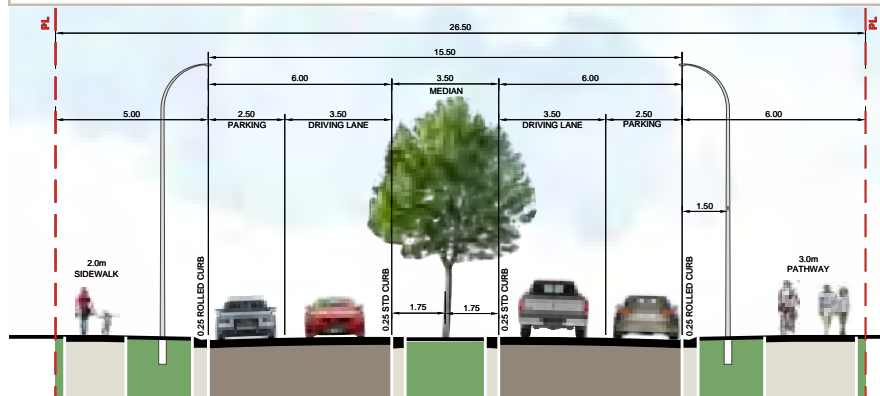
STANDARD COLLECTOR ROAD SECTION (22.5M)
